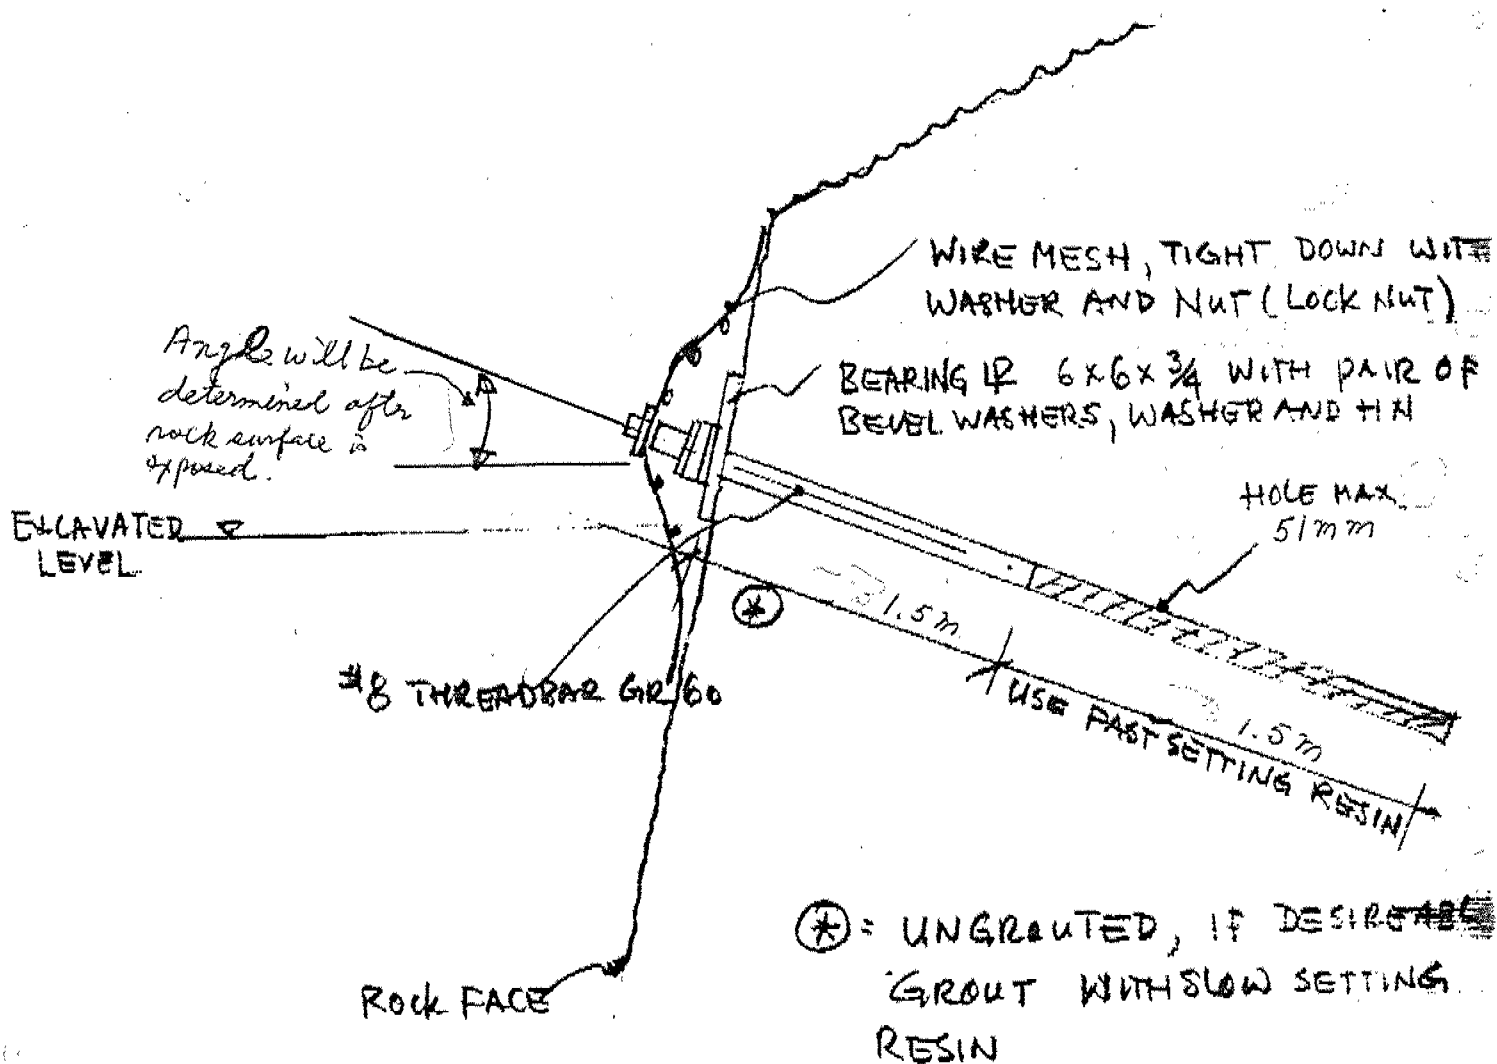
TYPICAL RESIN ANCHOR BOLT
